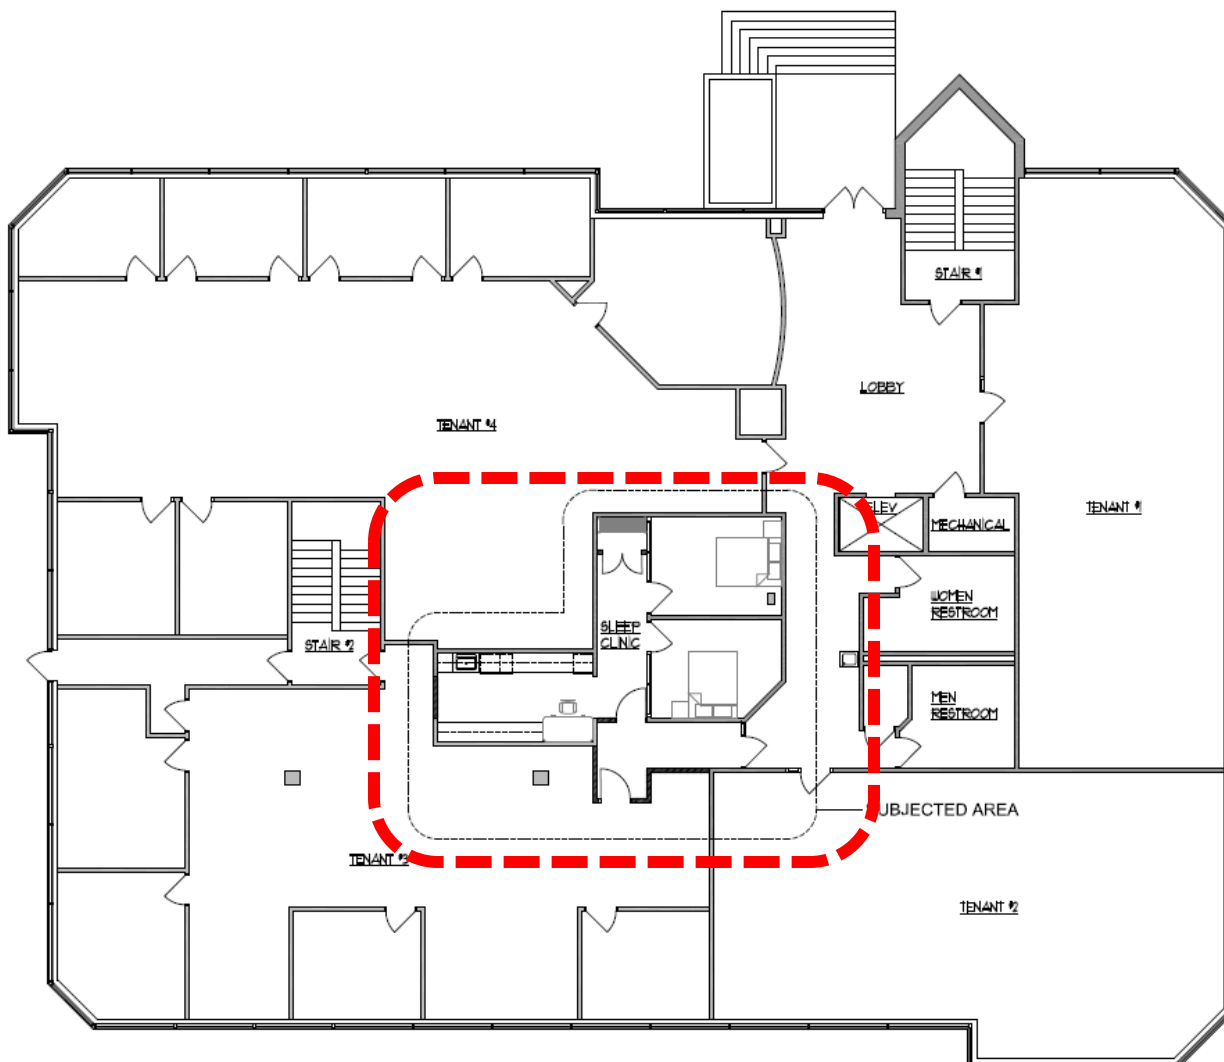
Floor Plan of the building at 275 N. Lindbergh Blvd, the area in red is the proposed Sleep Clinic
